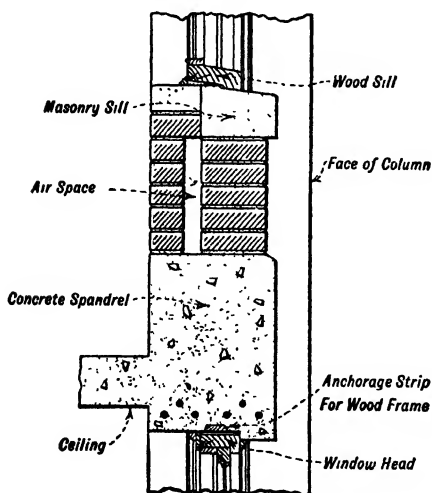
Upstanding Spandrel Beam Permitting Window Head to Come up Near Ceiling. (See p. 741.)
